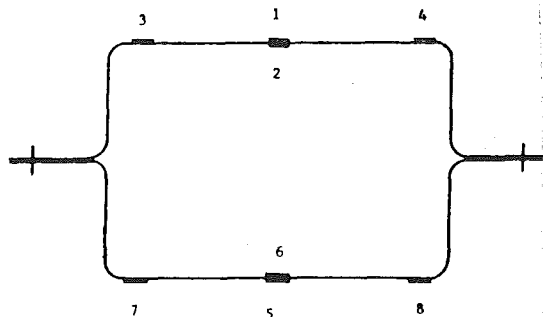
Locations of Strain Gages at Midheight of Box-Shaped Stub Columns
